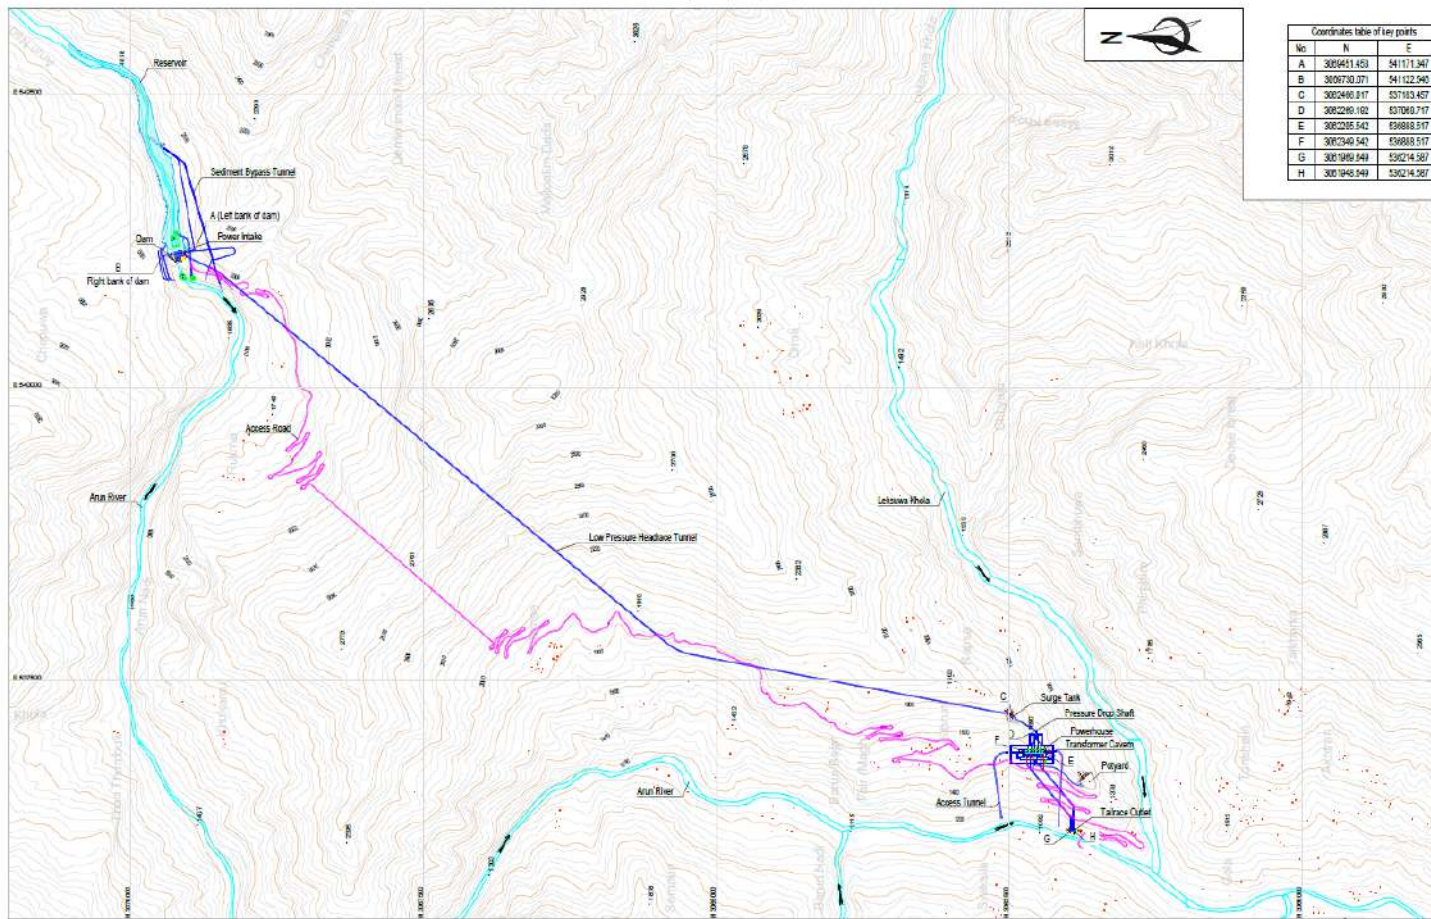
Project Access Road Layout and Ancillary Facilities
